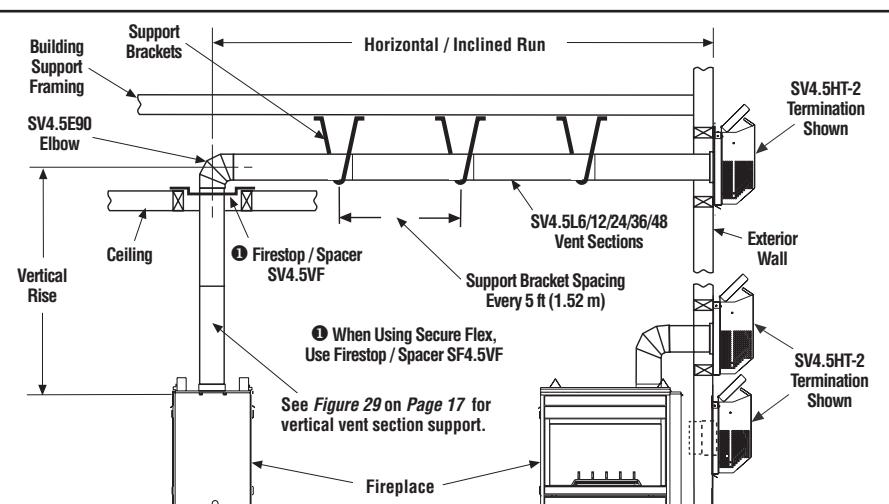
TYPICAL HORIZONTAL VENT INSTALLATION
